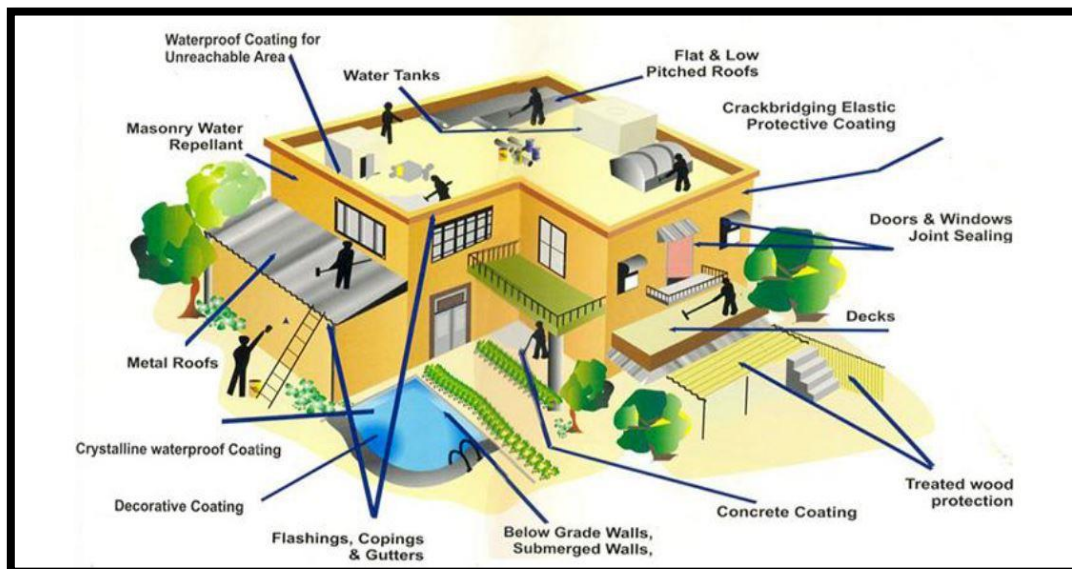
Building Elements Required For Waterproofing <sup>[1]</sup>
